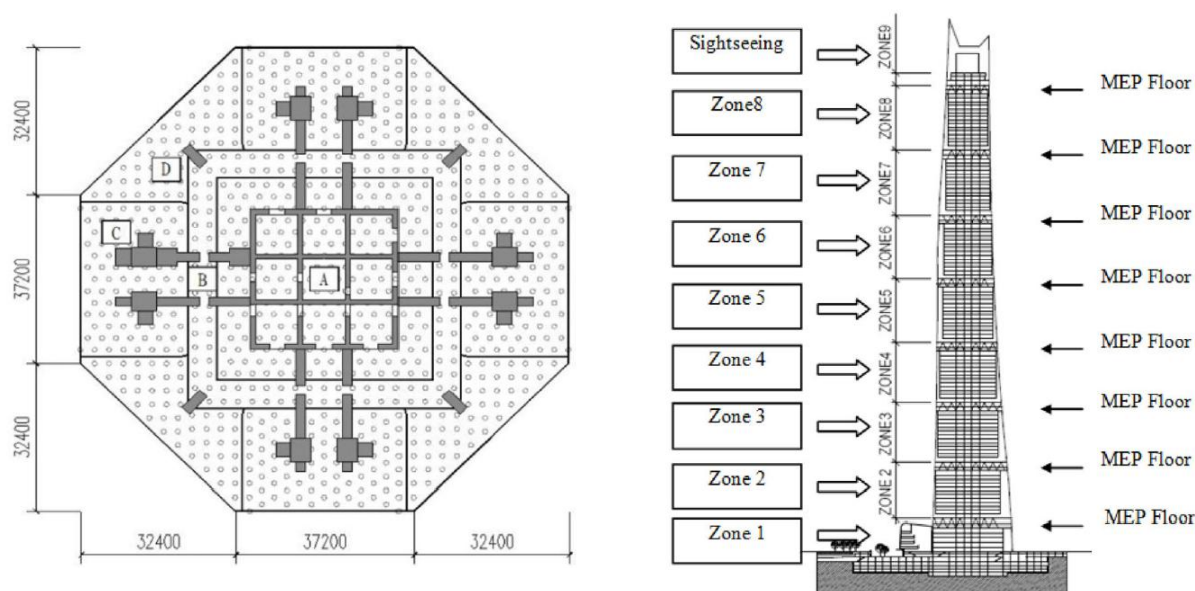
Shanghai Tower Foundation system and vertical zoning of the Tower
